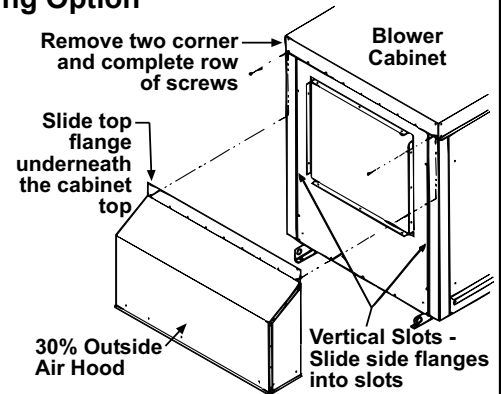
Installation of Air Hood with 30% Outside Air Opening Option
